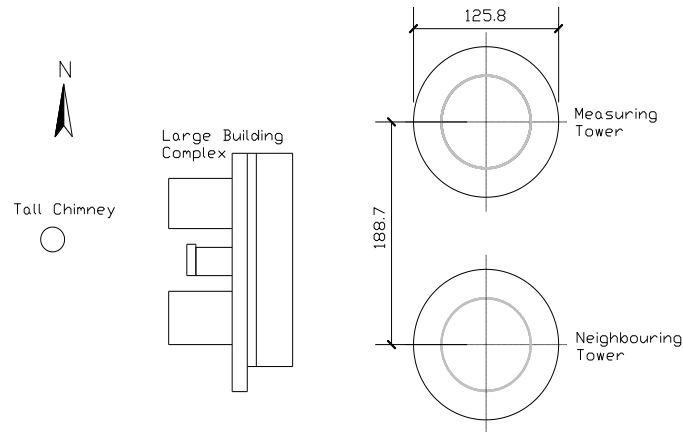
Site plan of Peng-cheng electric power plant (unit: m)
